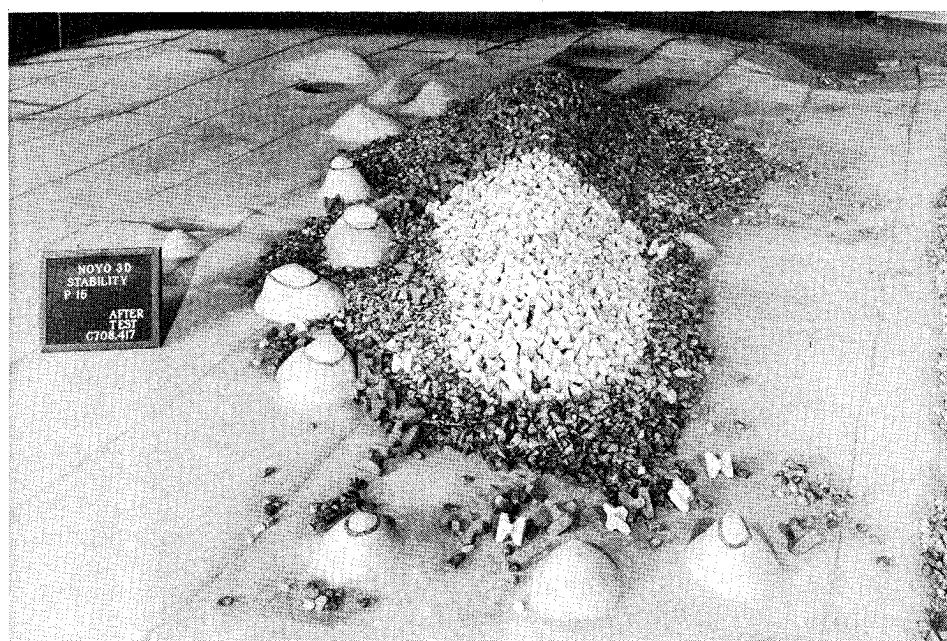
Plan 15, south roundhead after five series of Storm IB waves
